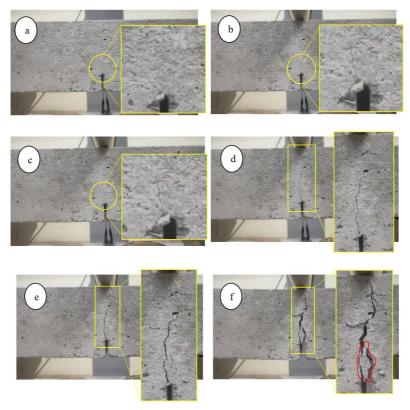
Crack propagation and crack pattern in hybrid fiber reinforced concrete
